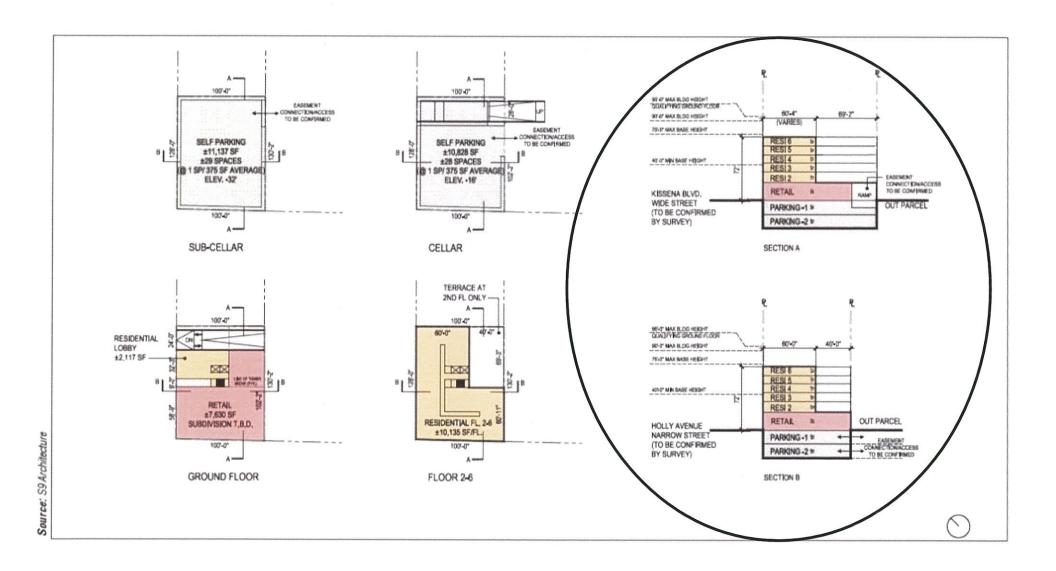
Sectional Plans - Proposed Development Site "A" (Lots 1 & 5)
